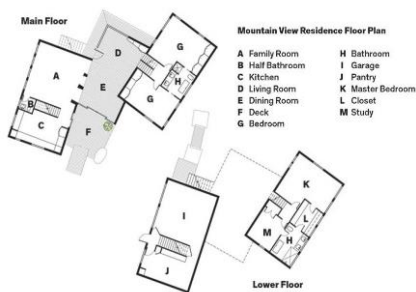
The layout of the dining room, base of the ground floor, architect Juliet Hsu⁹
